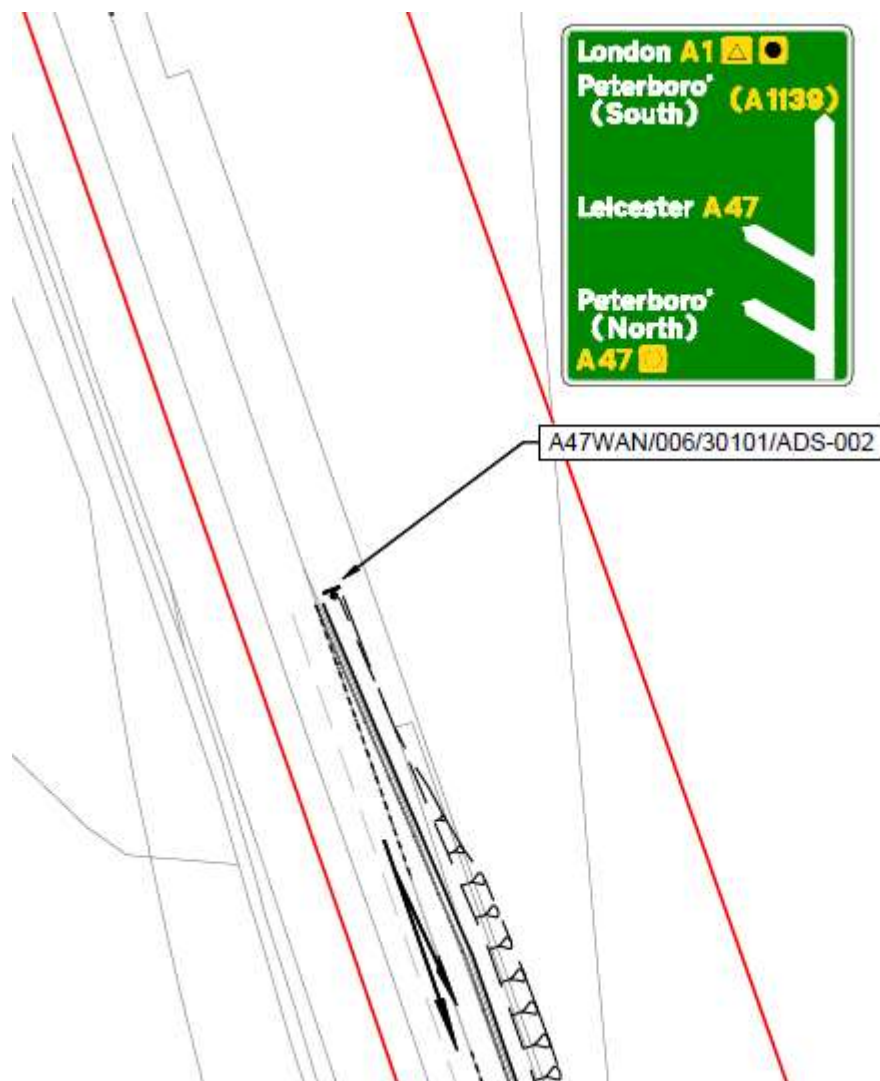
Proposed sign at A1 SB carriageway warning of the 2 successive exits.
